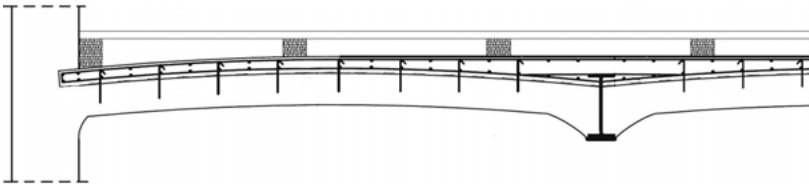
School in Gorlice. Segmental barrel vault over the ground floor. First project of reinforcement with reinforced concrete slab 7 cm thick anchored to the vault
